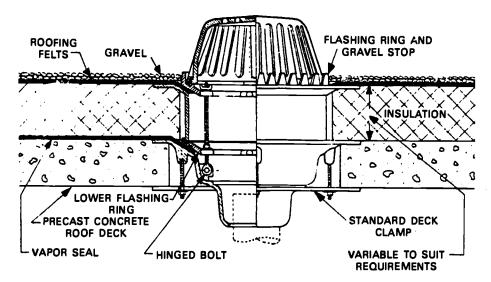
A series roof drain installed in a concrete roof deck with built-up insulation and roofing
